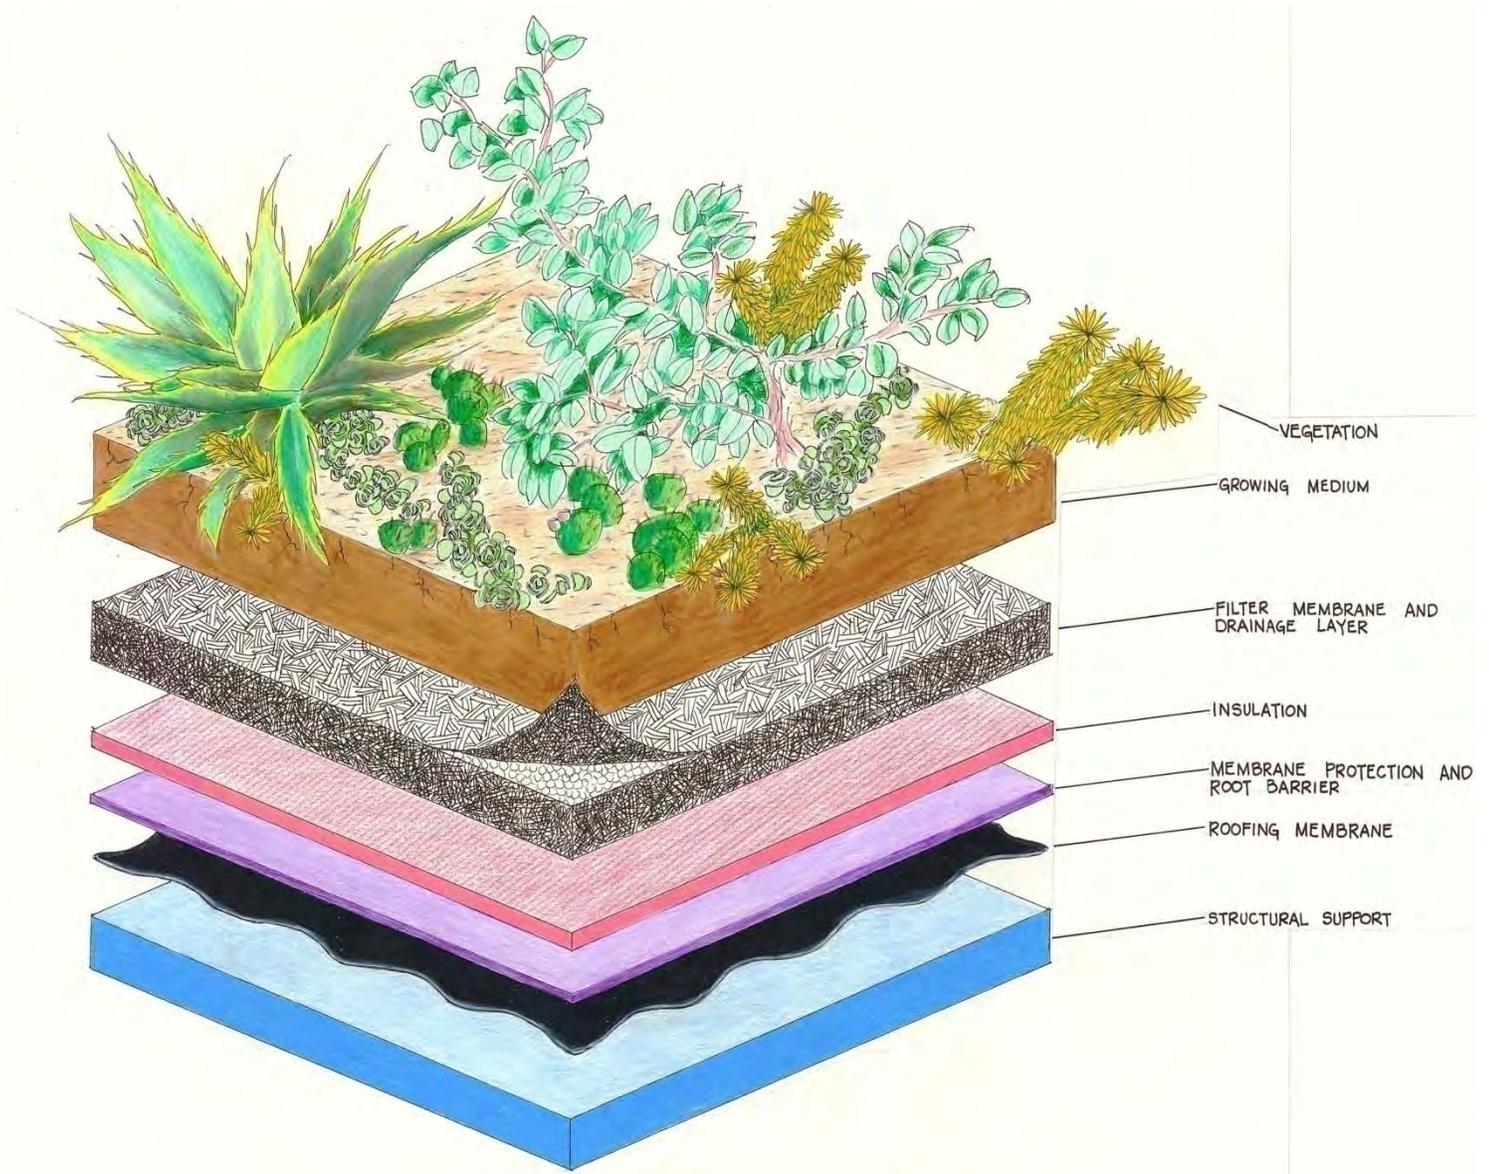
Typical Green Roof Cross Section. Graphic by Adia Davis.
